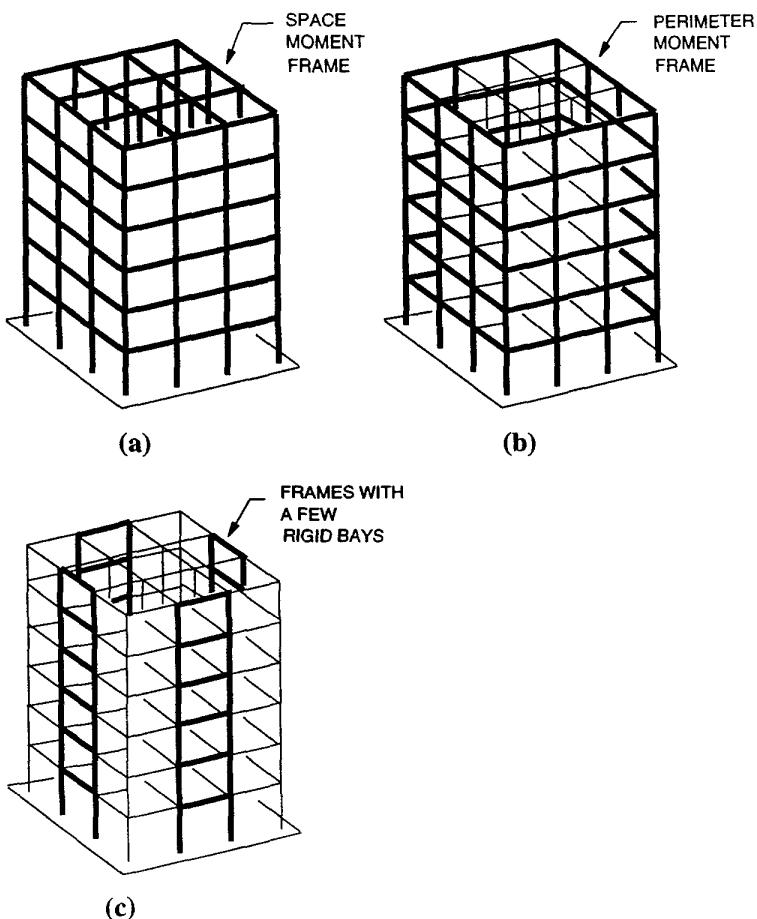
Space Frame, Perimeter Frame and a Structure with Only a Few Rigid Bays
